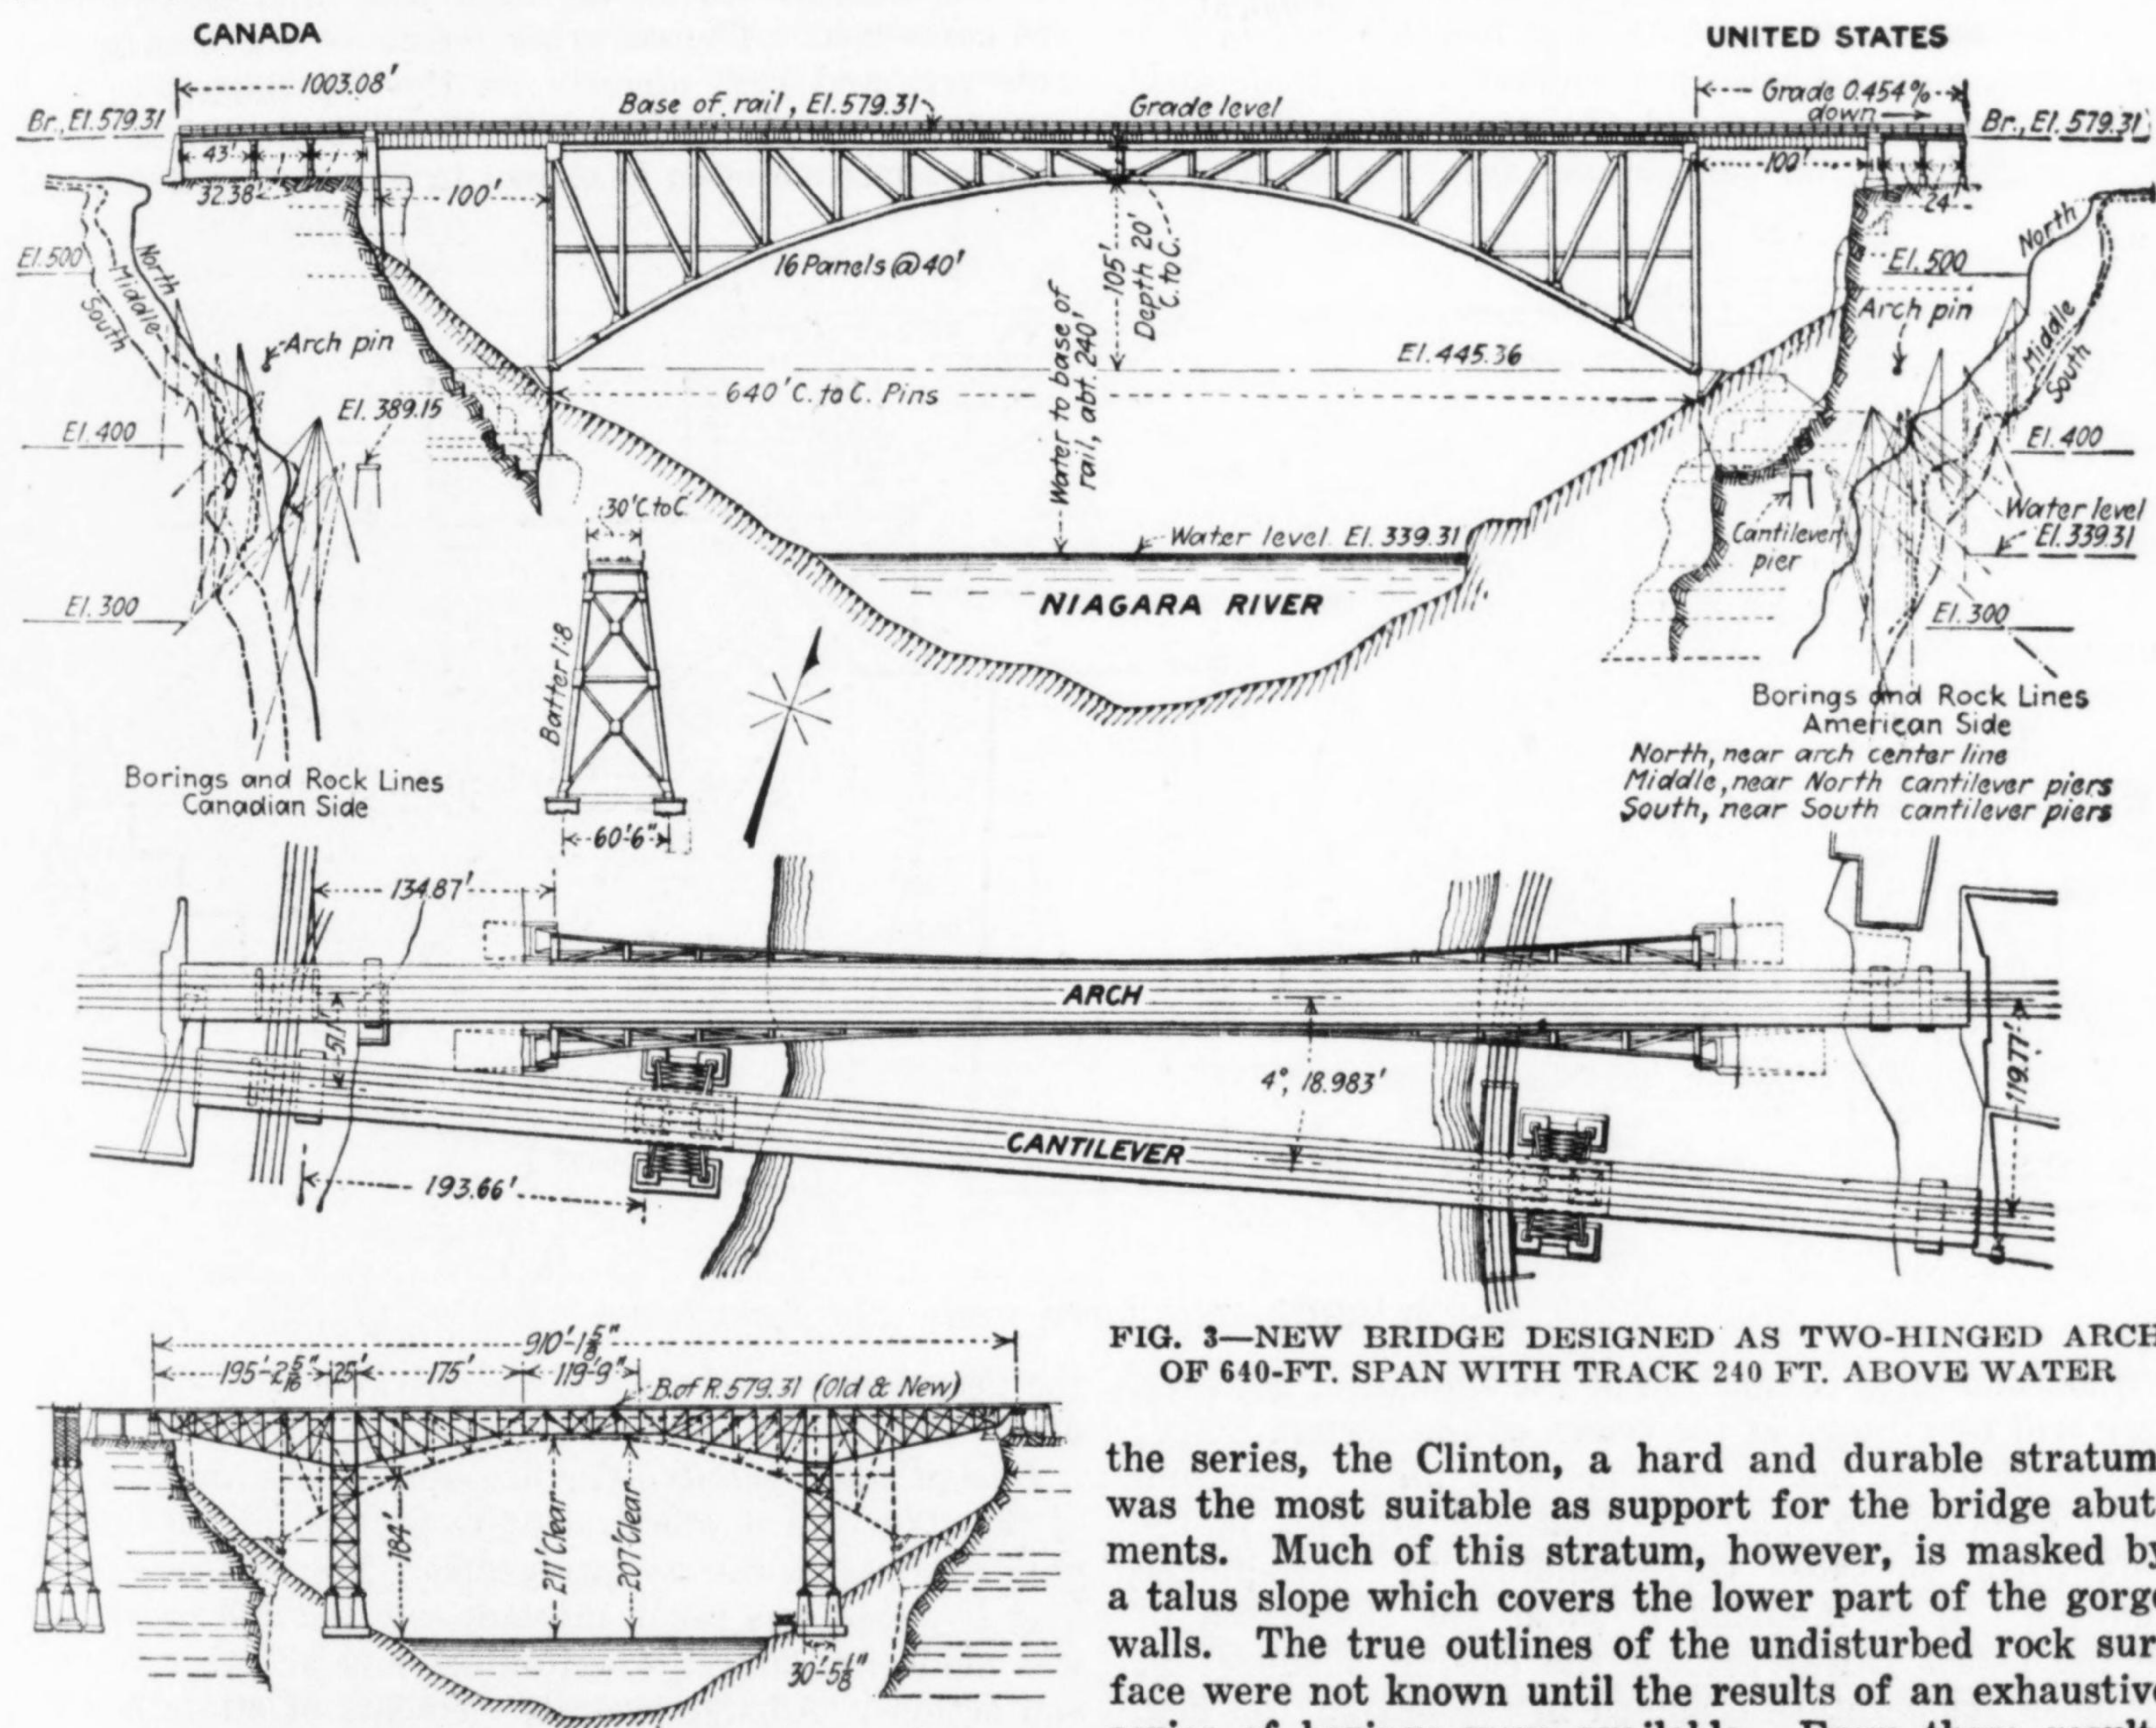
NEW BRIDGE DESIGNED AS TWO-HINGED ARCH OF 640-FT. SPAN WITH TRACK 240 FT. ABOVE WATER
